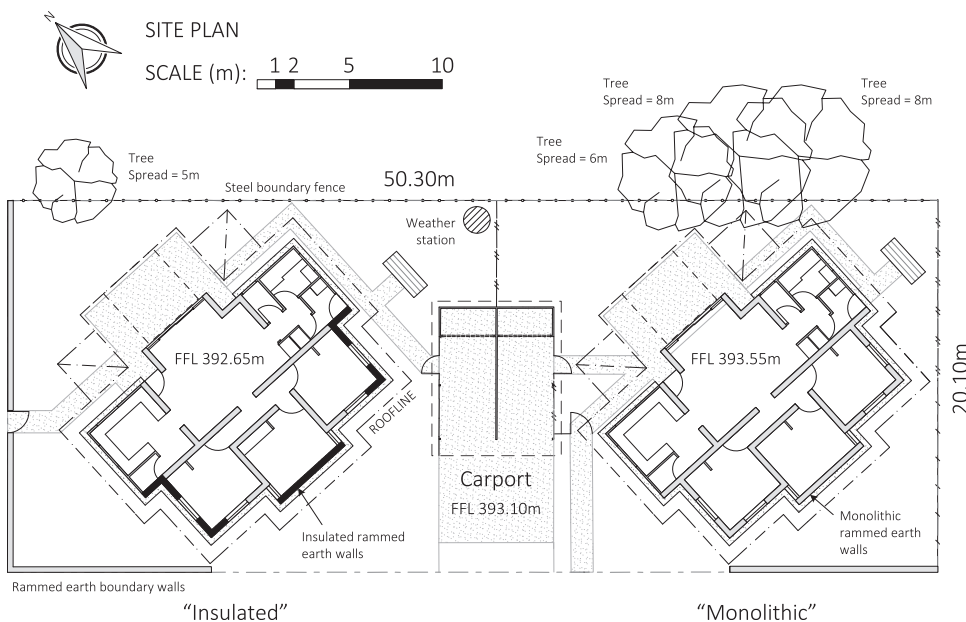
Site plan for the two houses. RE walls are shown in grey and iRE walls in black. Thin grey walls denote lightweight "Colorbond" walling construction. FFL: Finished Floor Level (above mean sea level).
